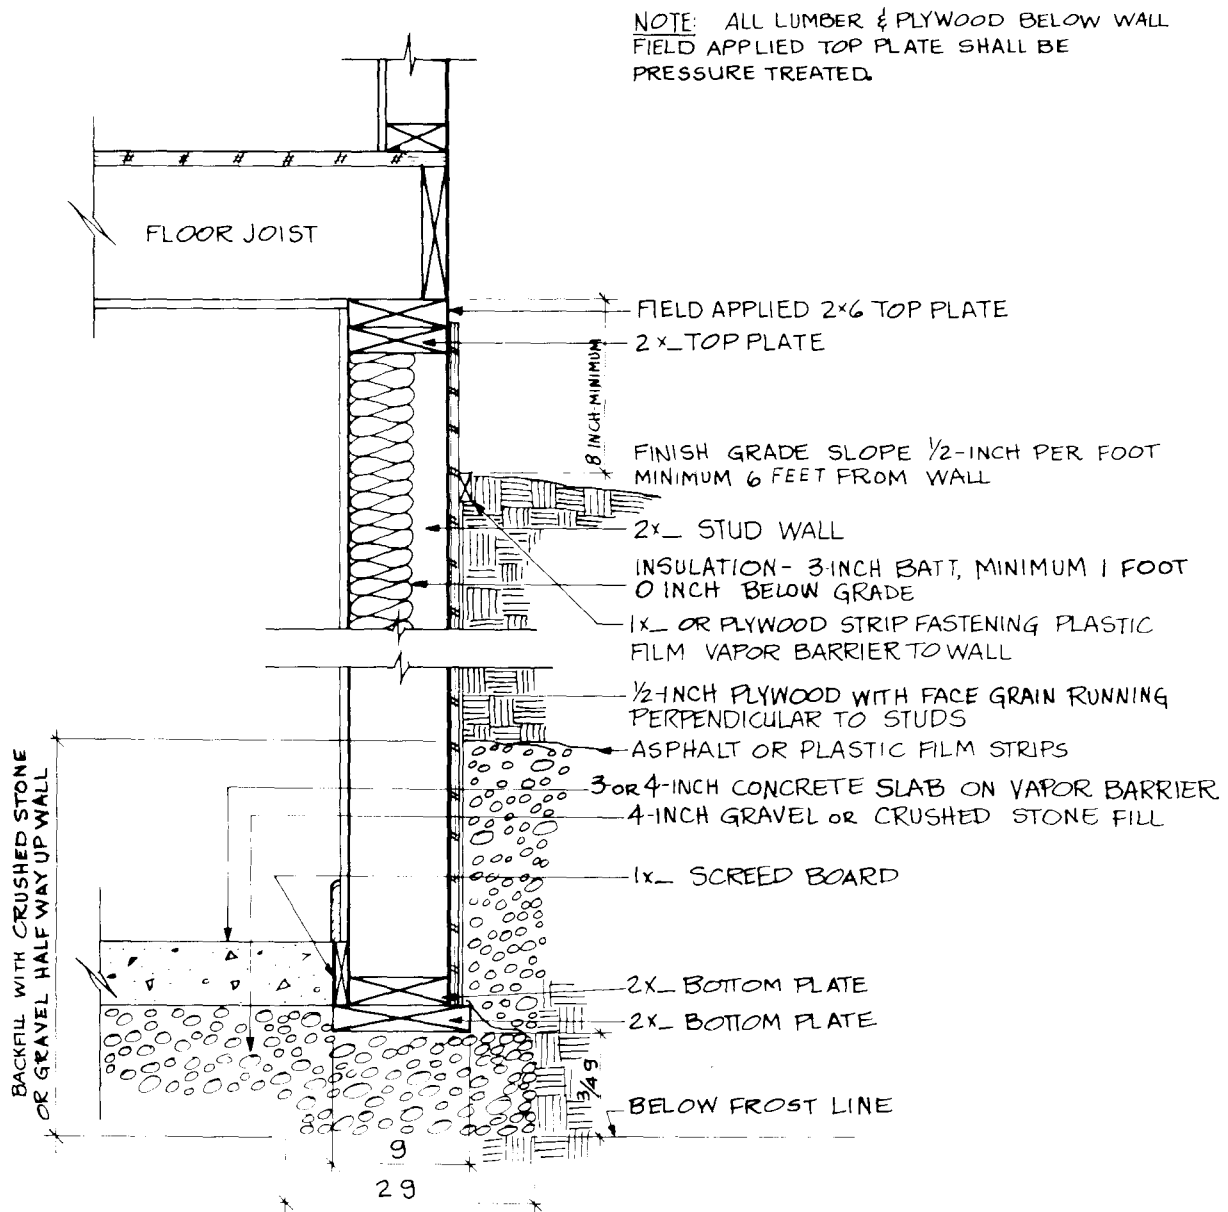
Basement wall constructed of treated wood incorporates design concepts to prevent basement leakage.
